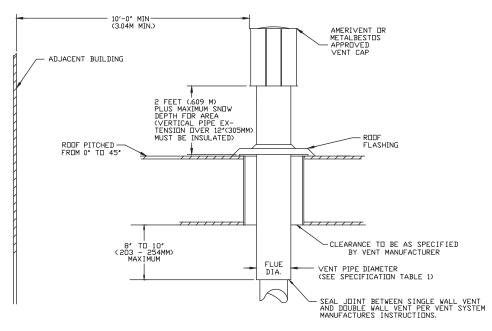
B - Vertical Arrangement - Single Wall Vent System to Double Wall Termination
